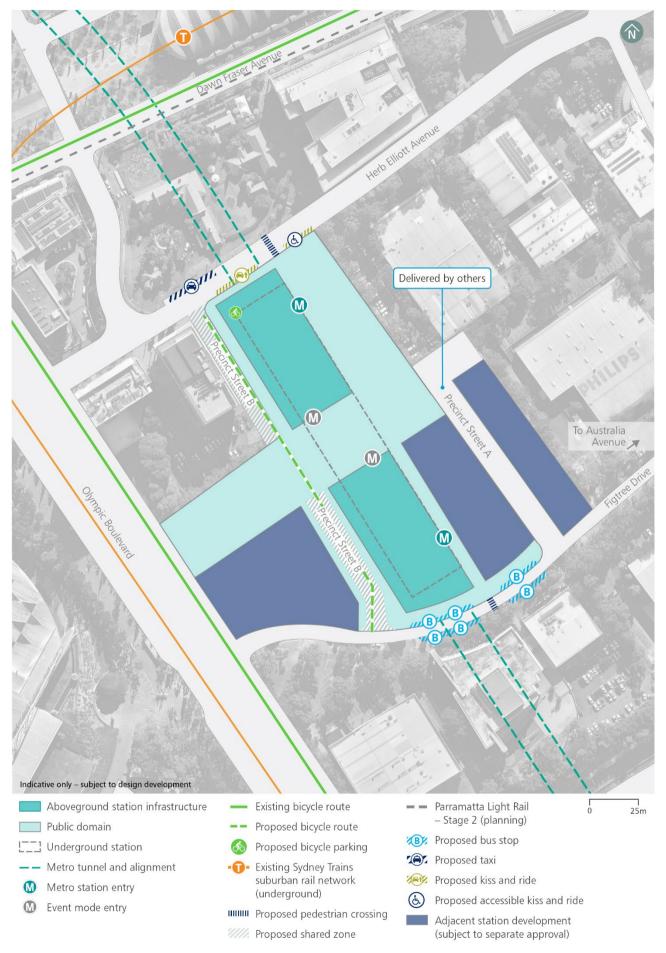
Indicative layout and key design elements - Sydney Olympic Park metro station
